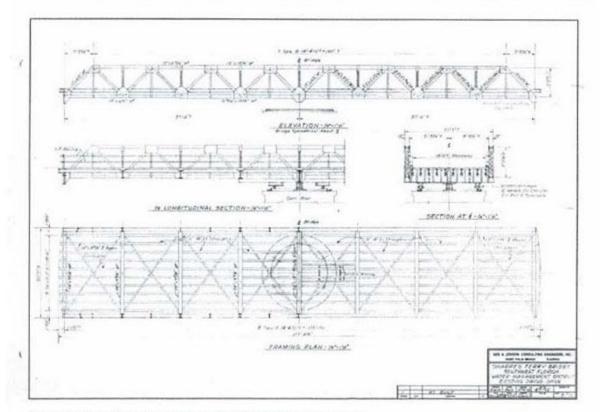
Sharpe's Ferry Bridge Existing Swing Span Drawings
